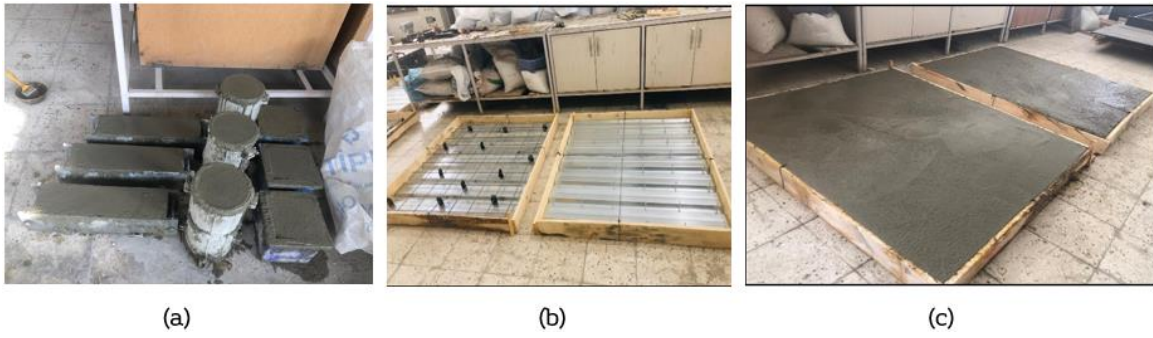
Concrete mixture experiments: a) Concrete poured into cube, cylinder and prism molds b) Placement of the studs to the sheet steel without concrete c) Model composite floor
